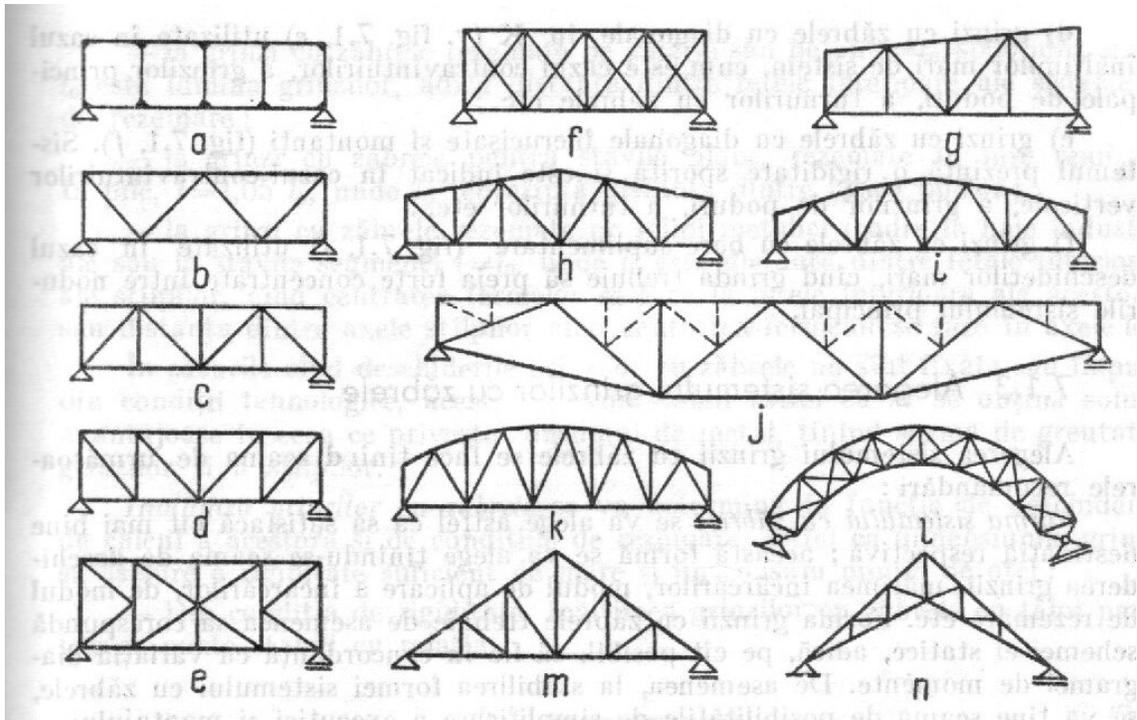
Truss girders – typical applications for elements under axial loads (except case (a) - Vierendeel truss with rigid connections where the elements also resist substantial bending forces).
